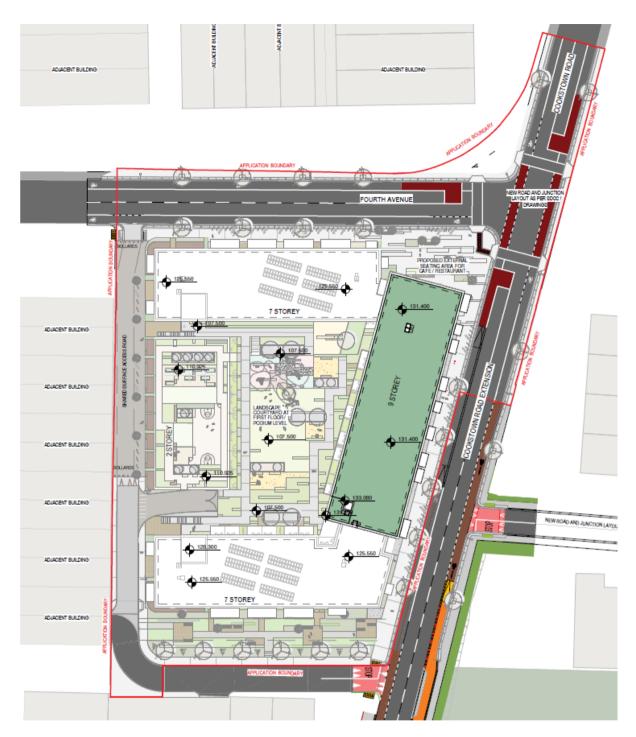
Site layout plan of proposed development under ABP Ref. ABP-308398-20
